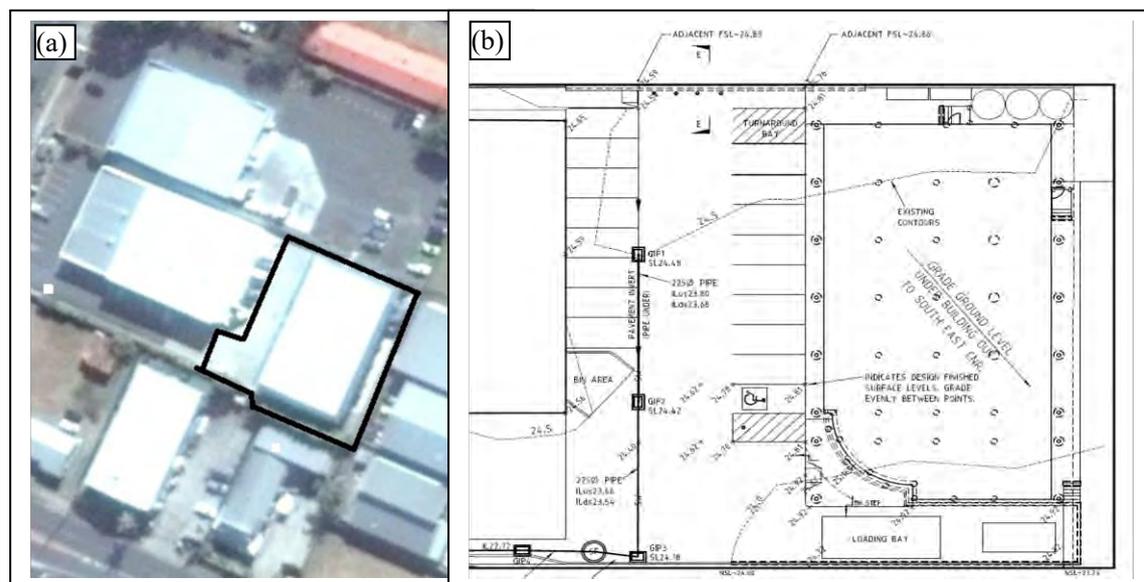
Study Site: (a) Aerial View; (b) Drainage Network
